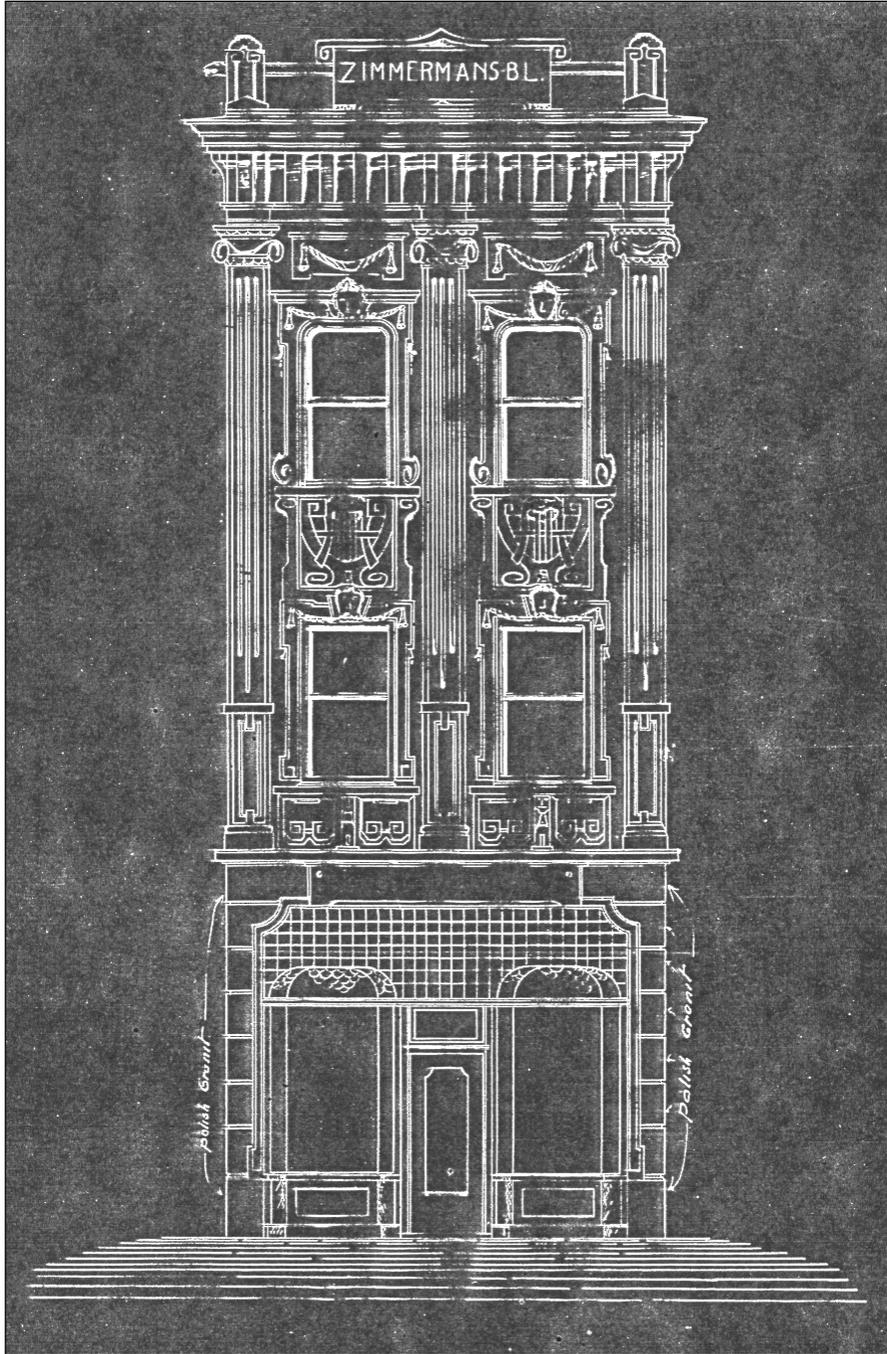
Architects Plans, “Front Elevation.” (Courtesy of the City Archives, Plan #2401/1913.)
